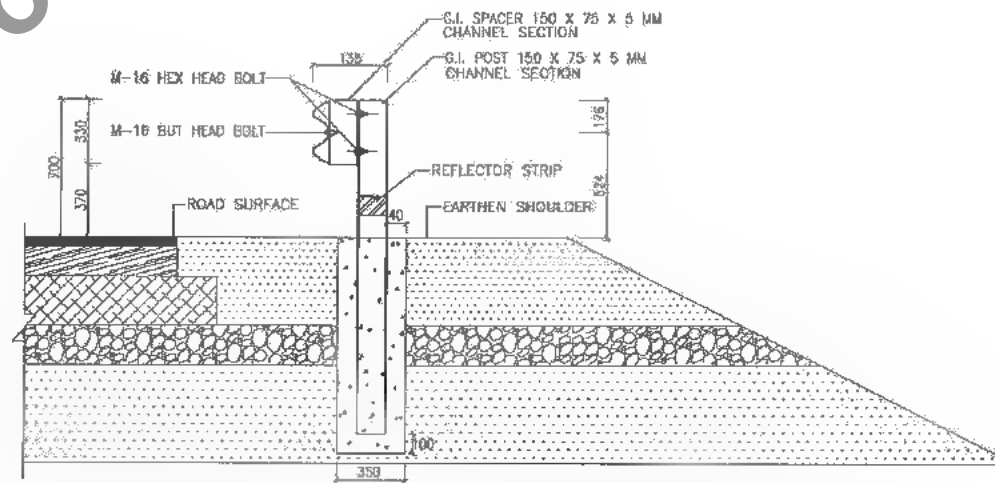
DETAILS OF CRASH BARRIER FOR DECK SLAB / RCC BOX
